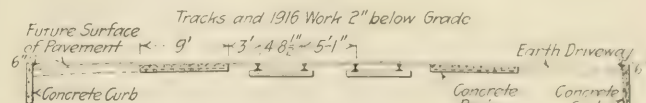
STREET 65 FT. WIDE WITH TWO 9-FT. STRIPS OF CONCRETE PAVING, AT ROYAL OAK, MICH.
